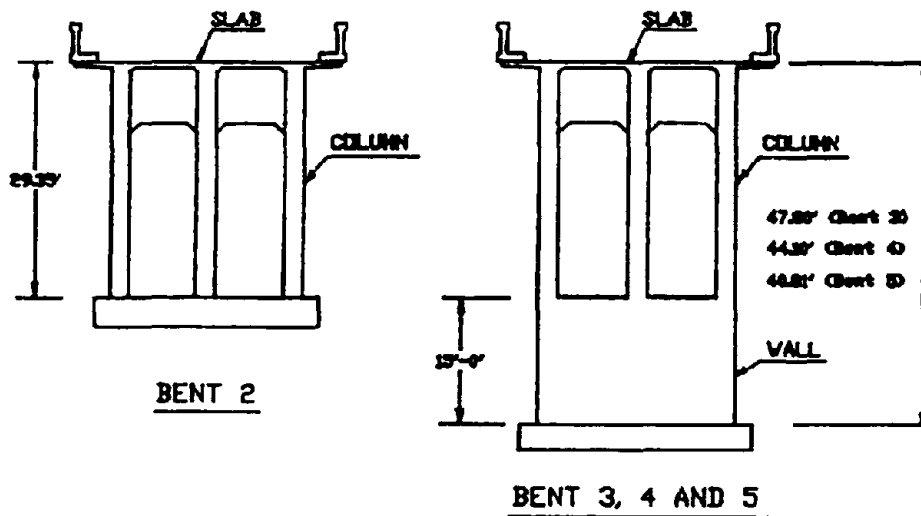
Bent Elevations for San Gregorio Bridge.
